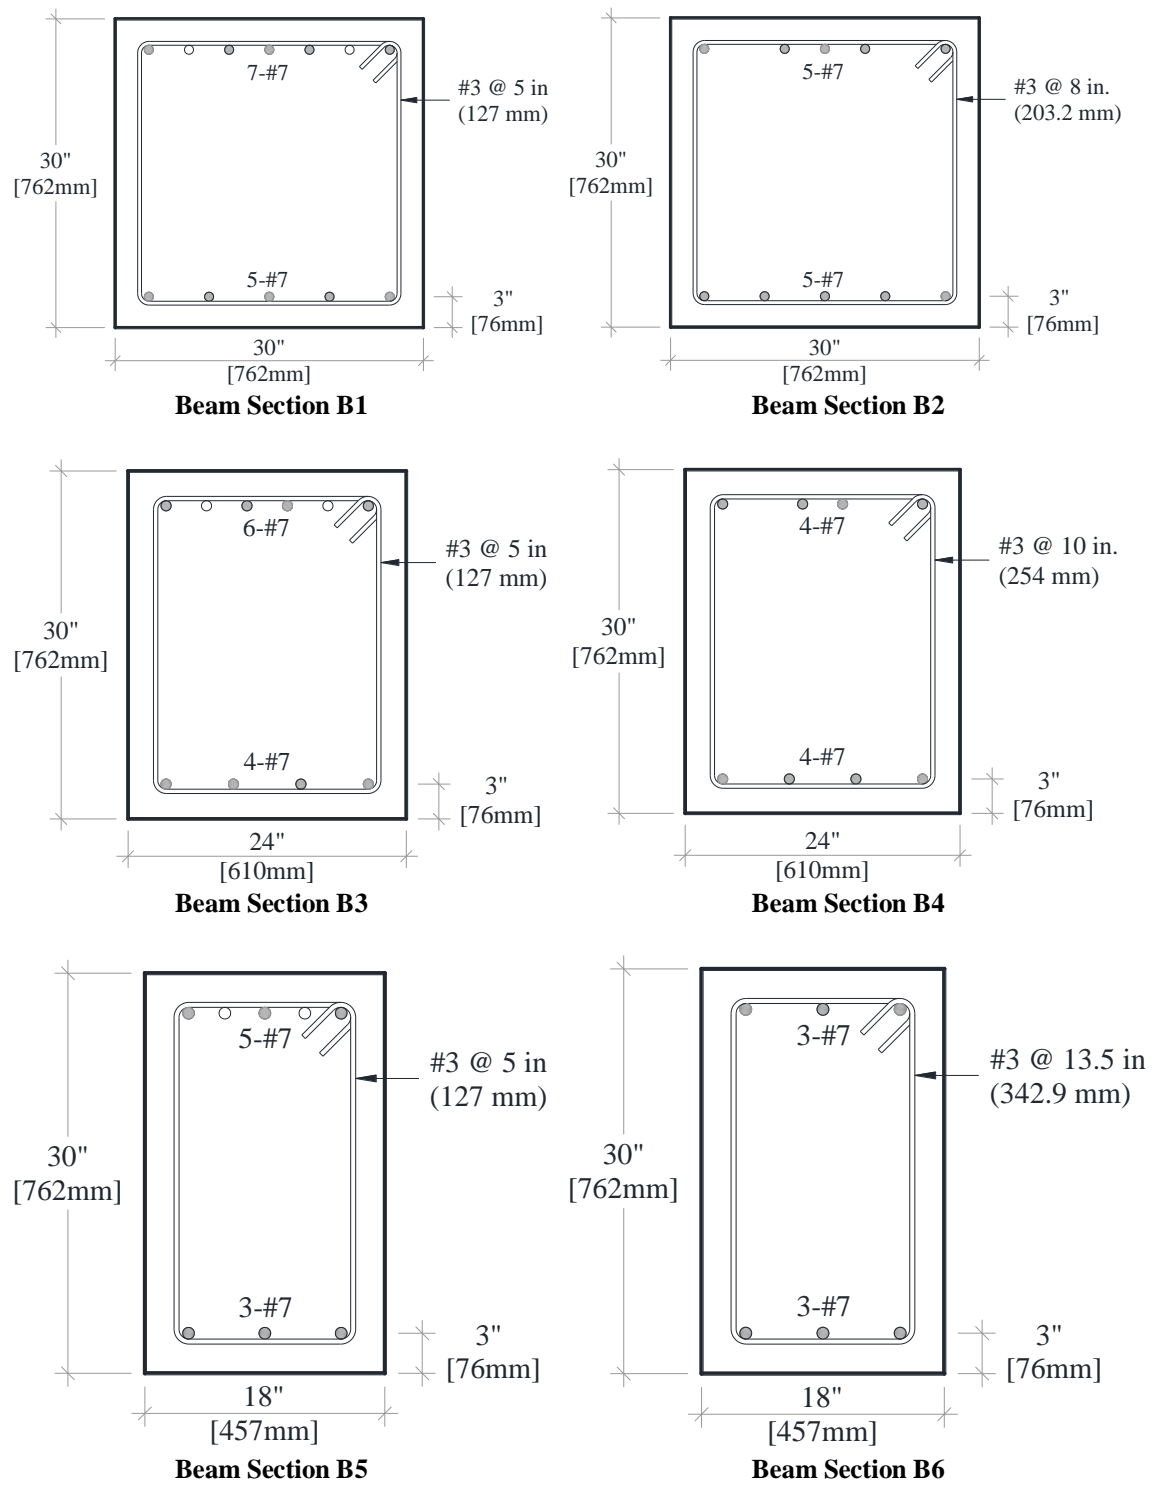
Section Details for Nine-Story Special Moment-Resisting Frame
